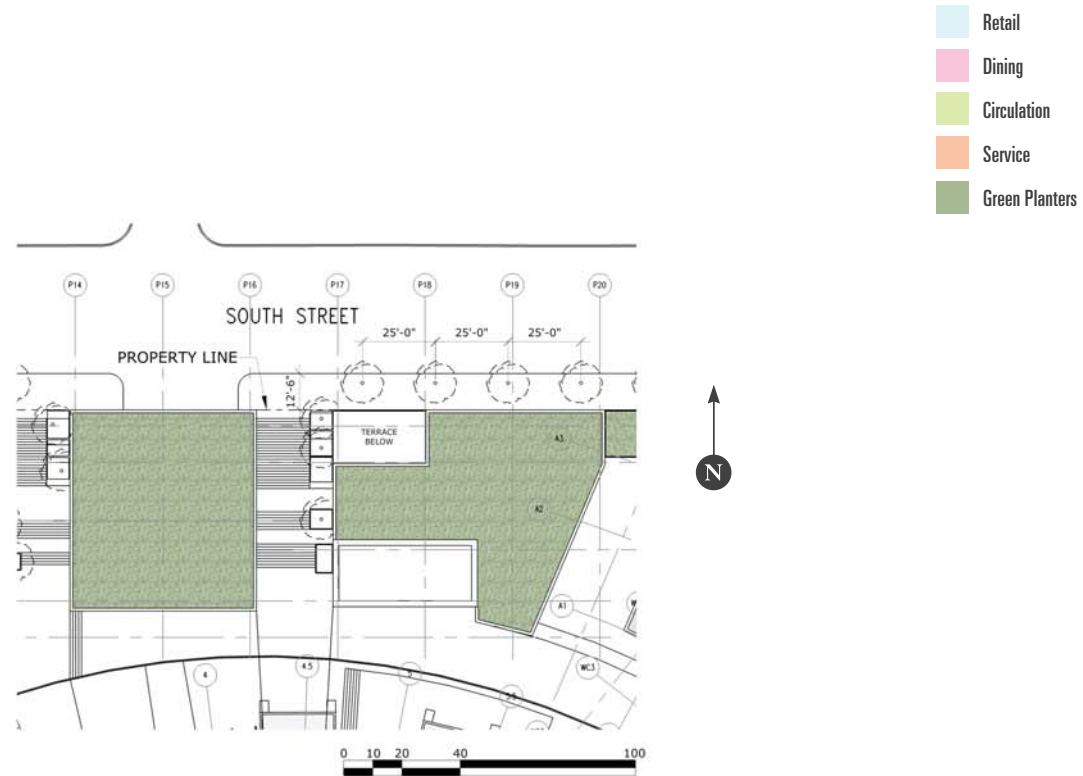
| SOUTH ST RETAIL ROOF PLAN
